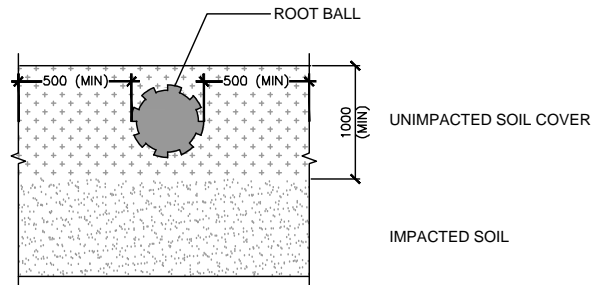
C SOFT CAP CONSTRUCTION - LANDSCAPED AREA NTS
